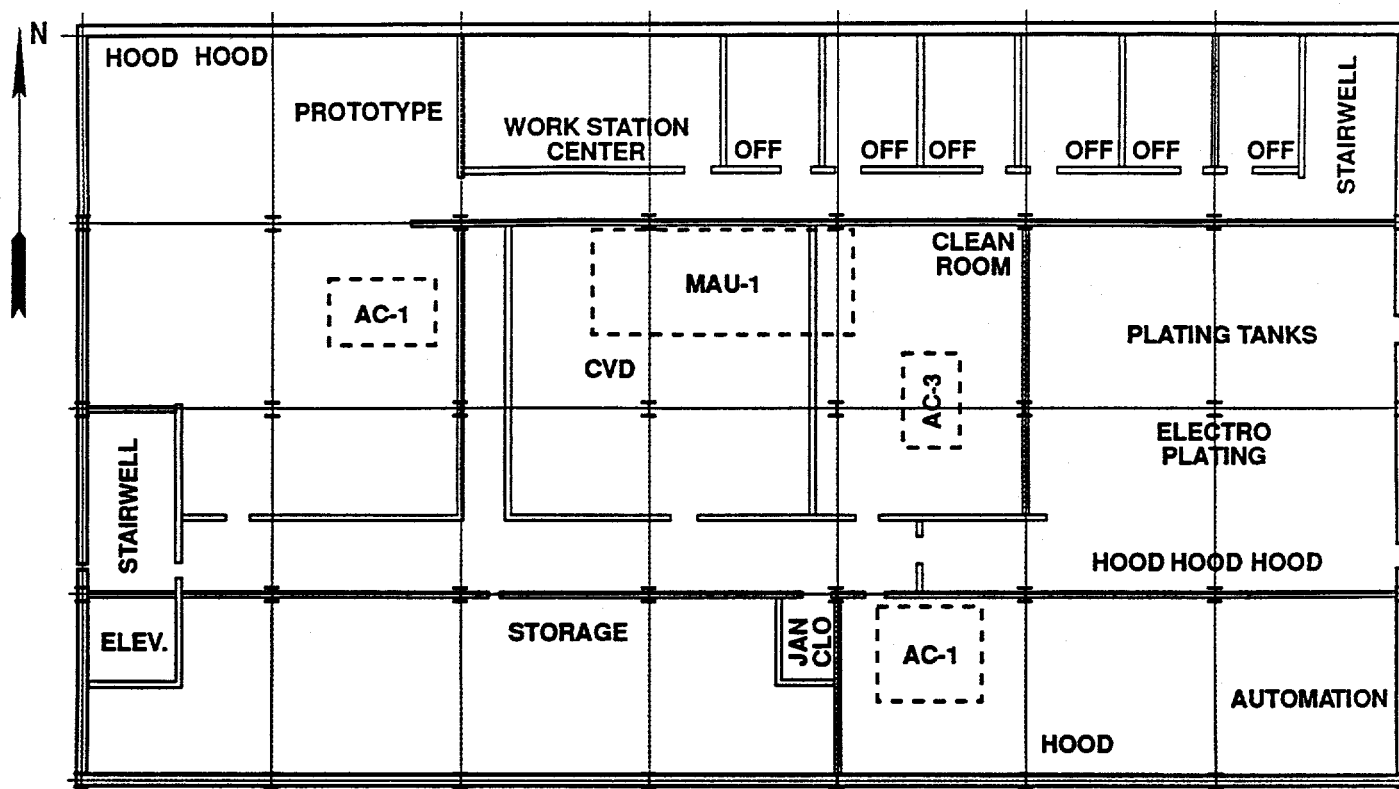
Plan View of the Proposed General Plating Facility, 2nd Floor
